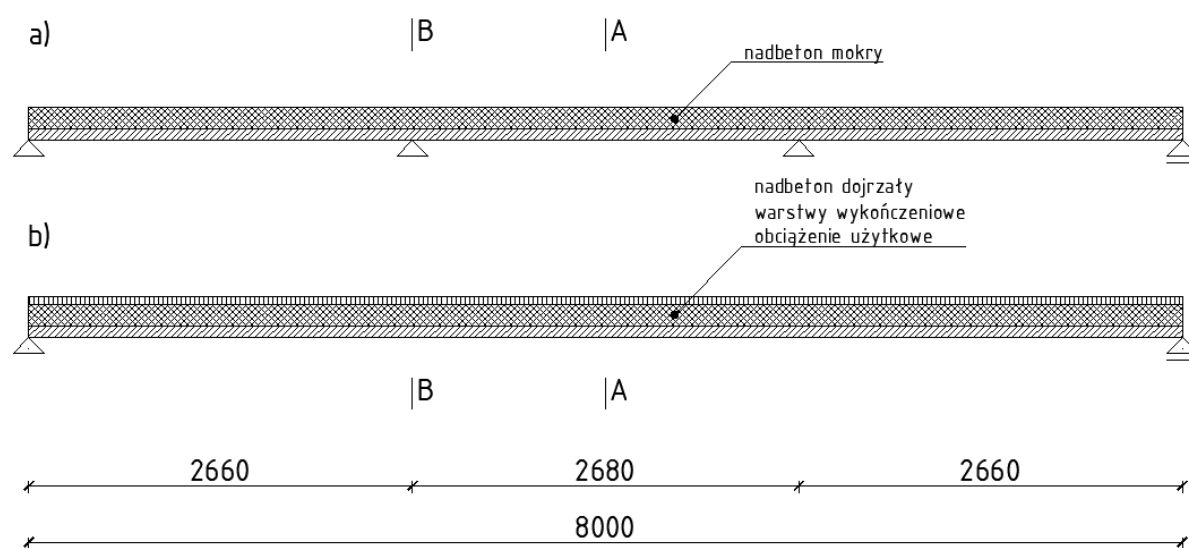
Static scheme of prestressed plank: a) assembly phase, b) composite slab
